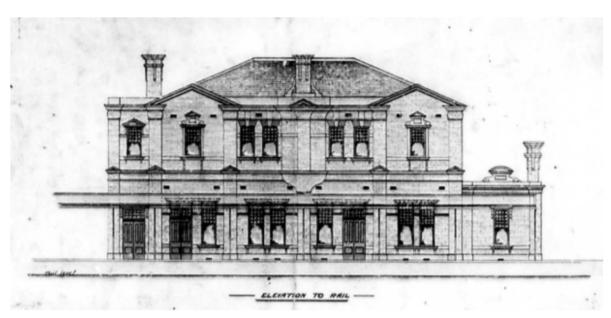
1890, refreshment Room Building (OCP Architects, 2020a:21)
